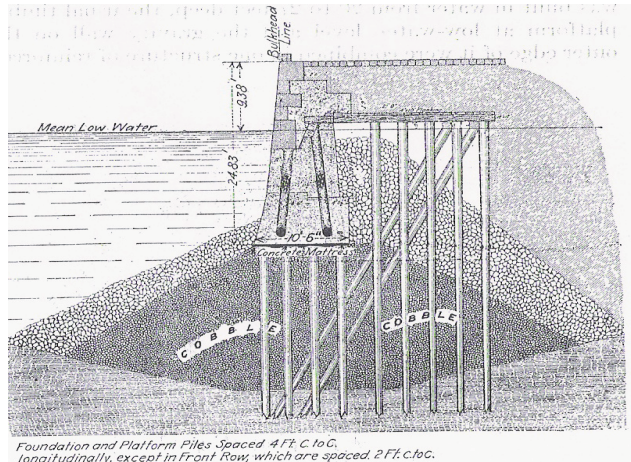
Cross-section of combination of retaining and gravity type wall New York 1899 [Greene 1917]
